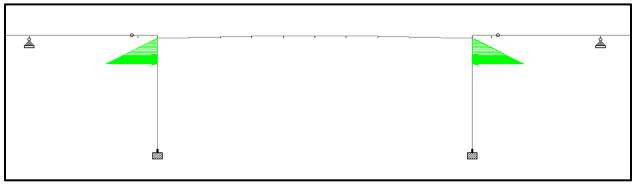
Lateral Earth Load on 6-ft. Abutment Wall
